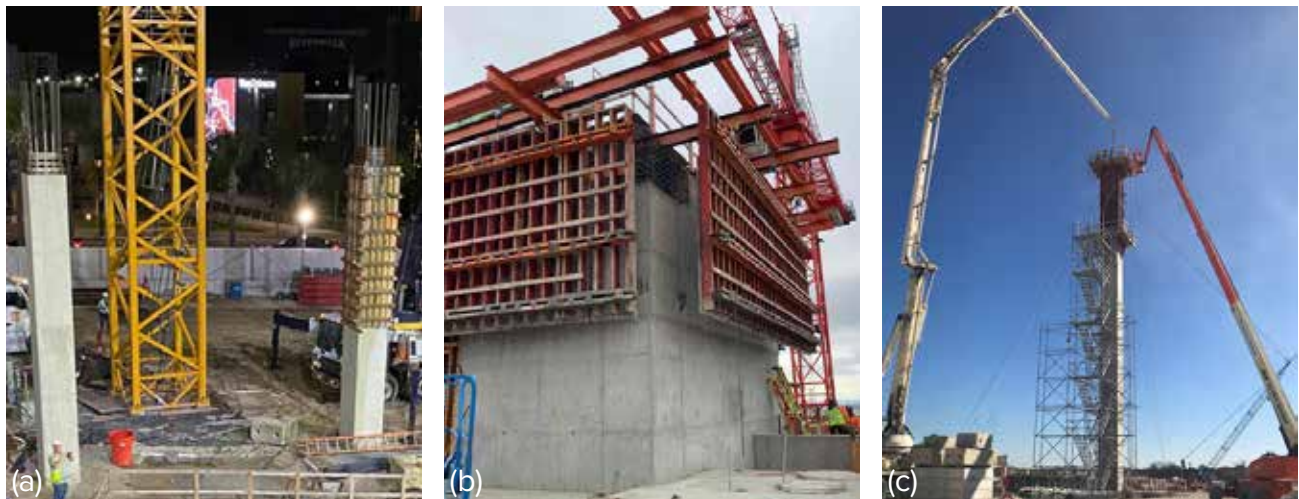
Examples of multiple-lift formwork applications for tall story heights: (a) double-lift column construction. (Image courtesy of Ceko Concrete Construction); double-lift wall construction. (Image courtesy of Related); and (c) five-lift column construction using a single column form. (Image courtesy of Ceko Concrete Construction.)
